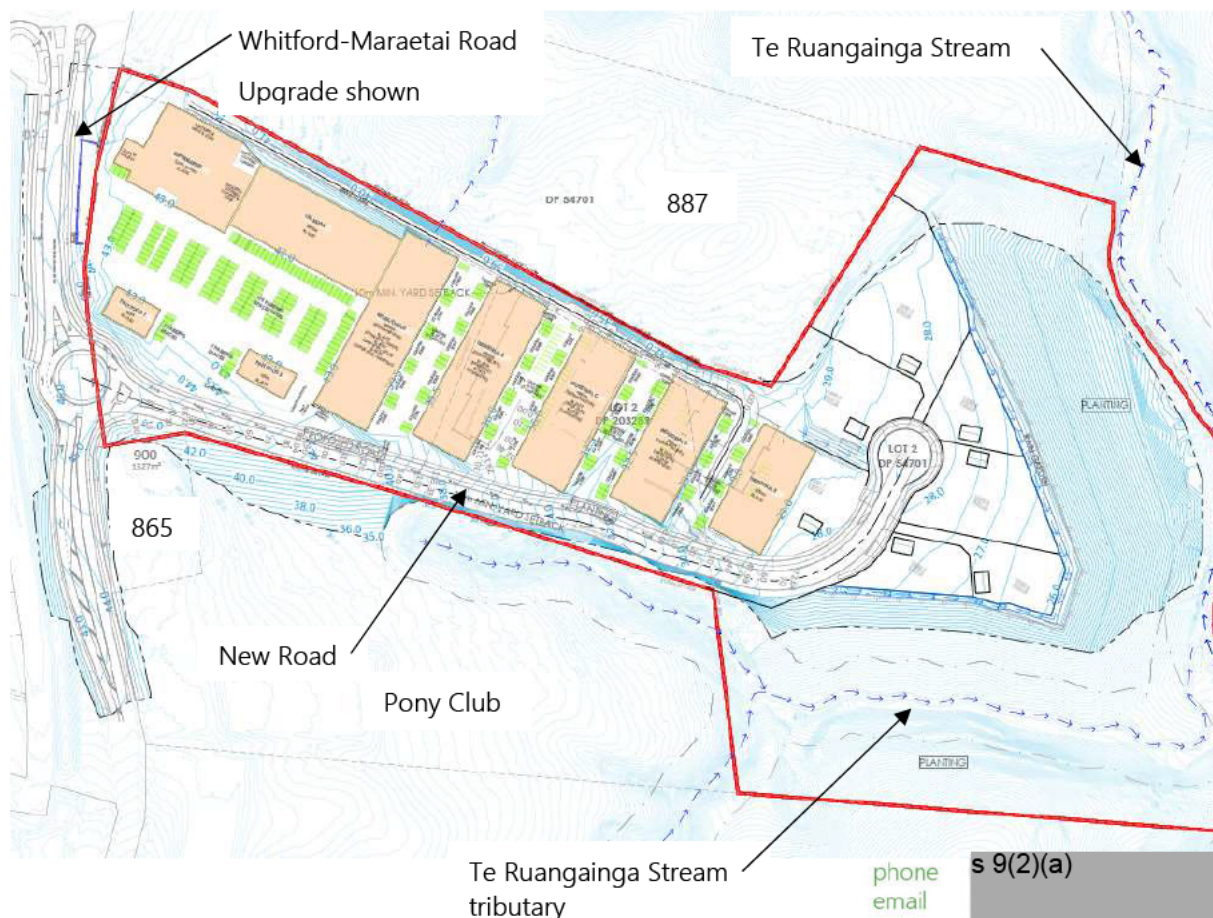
Concept plan for proposed application prepared by Civilplan dated 24-02-2025. For the purpose of this report, north is up the page.
